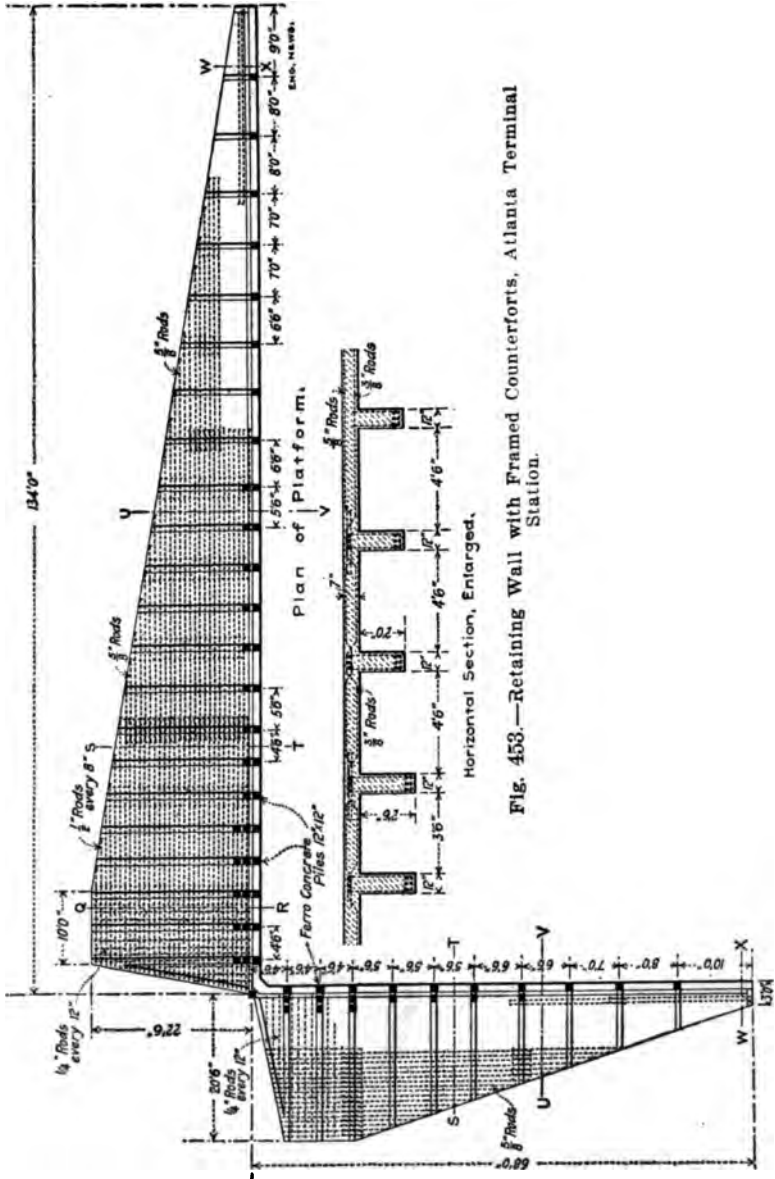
Retaining Wall with Framed Counterforts, Atlanta Terminal Station.
